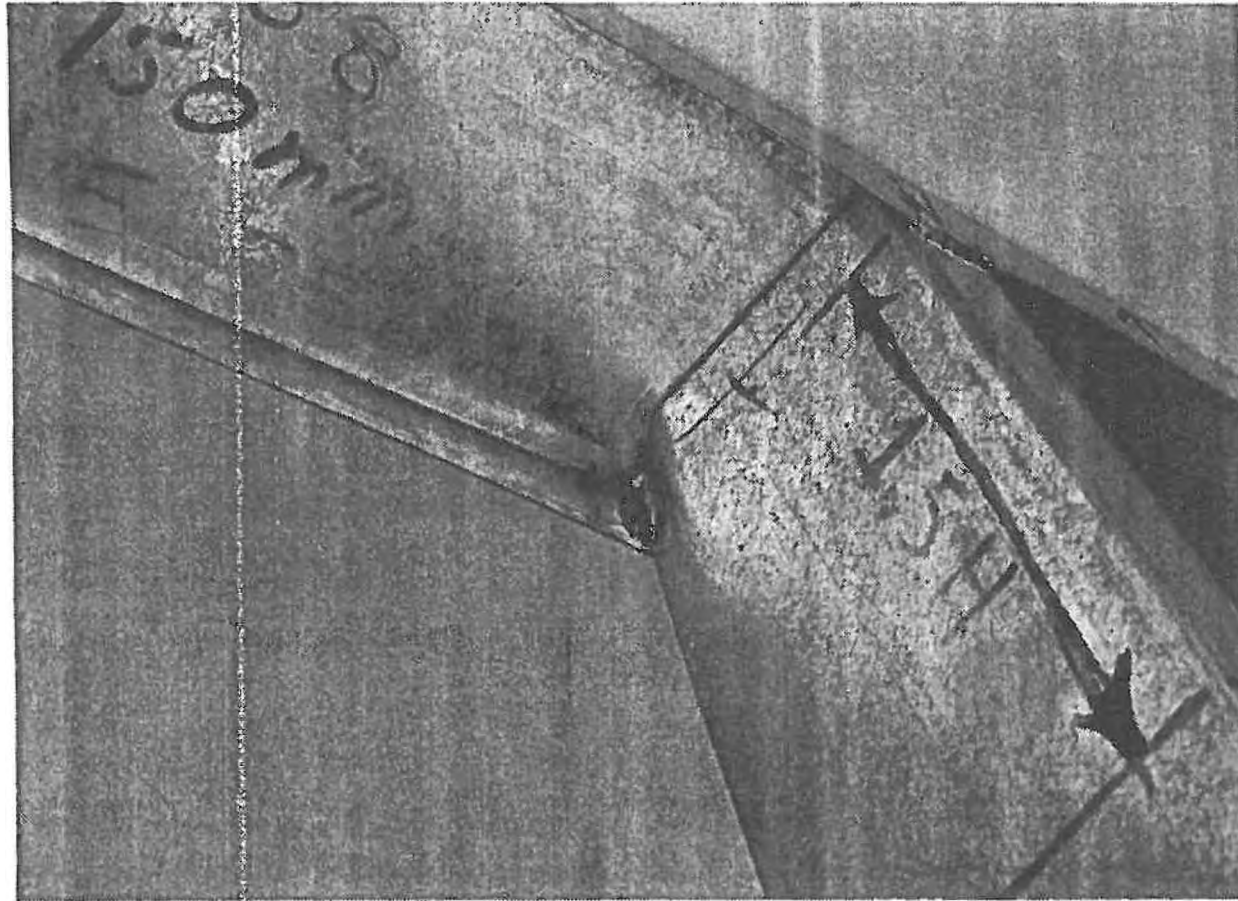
Photograph of Typical Failure of 18 Gauge, 150 mm Deep Welded Connection Specimen - Series 13
